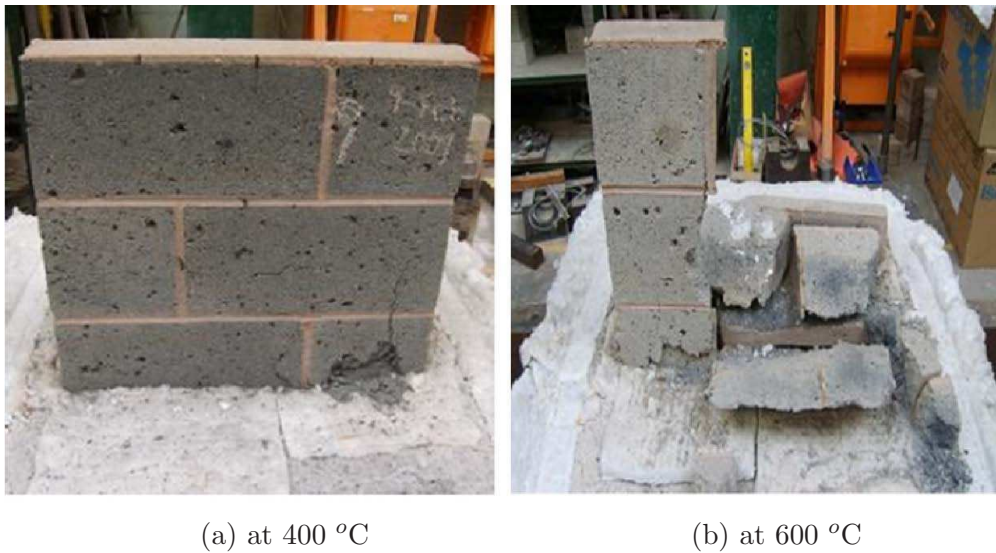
Failure modes of block-work masonry wallettes at high temperatures [67]
